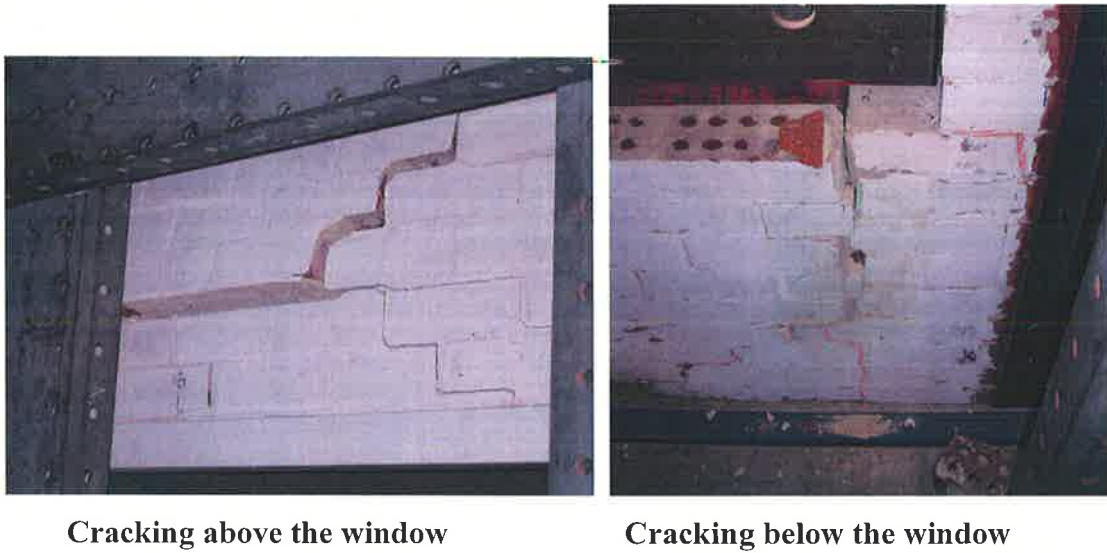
(d) Cracking patterns and failure modes of Wall 3
